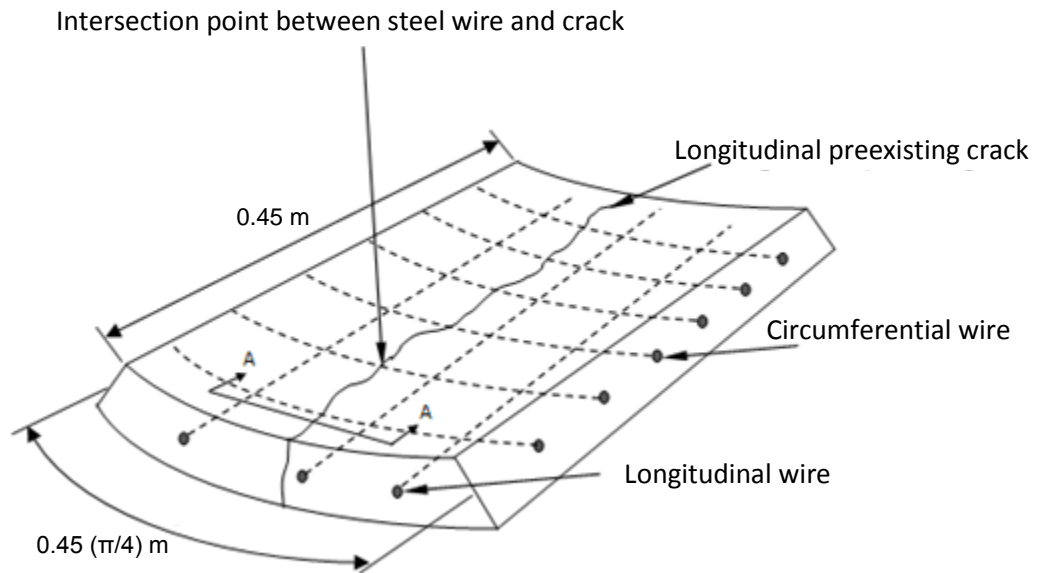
A schematic diagram for the mechanically-generated crack on a pipe specimen and the resulting crack-wire intersections
